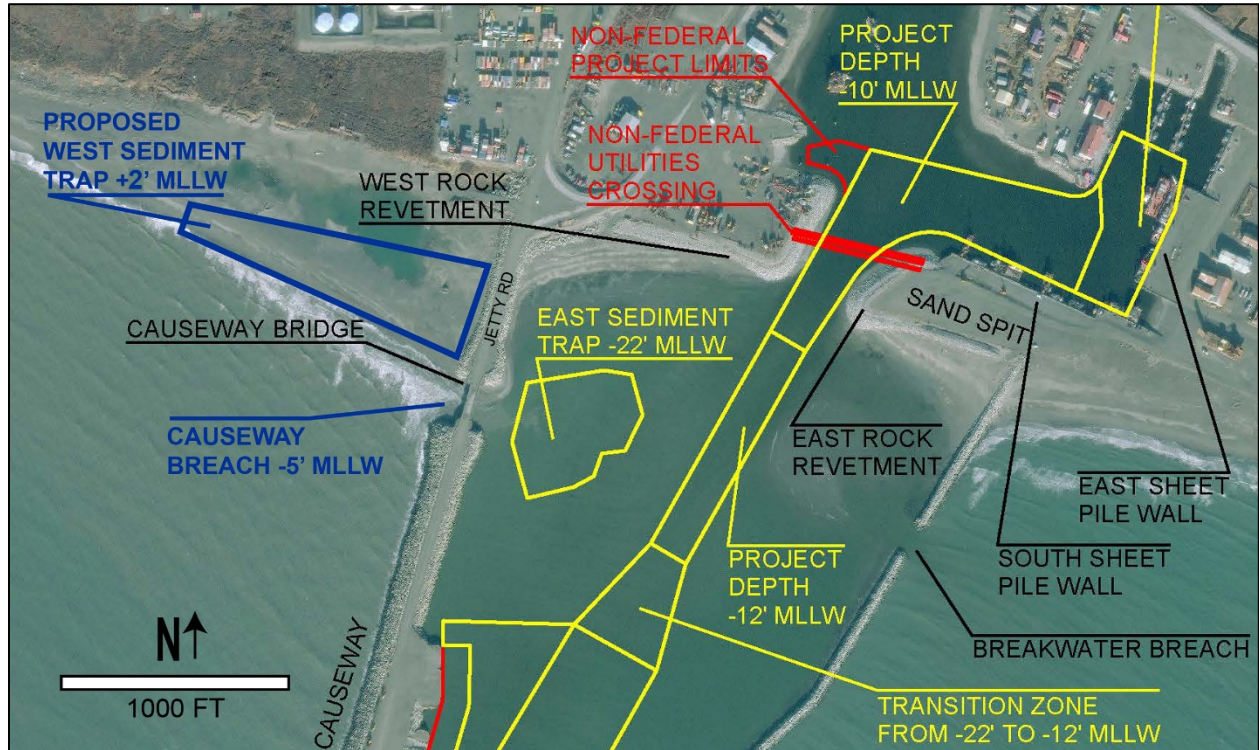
Location detail of the causeway breach and proposed west sediment trap (annotated from USACE 2019).
